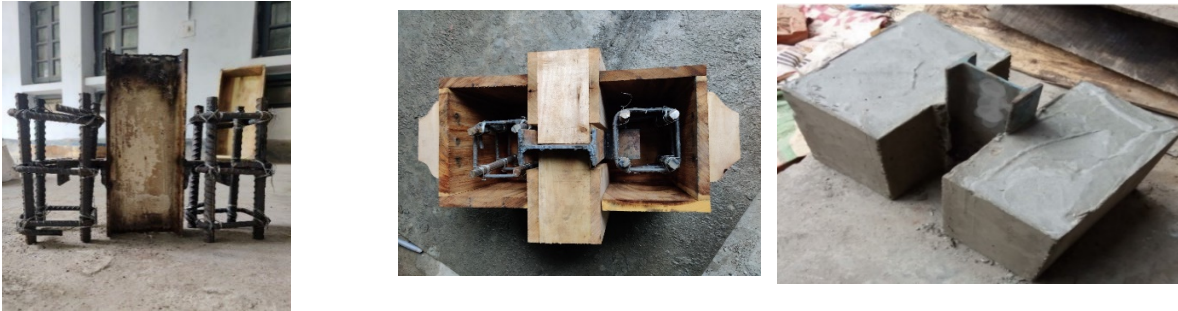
W-shaped girder along with reinforced steel, formwork, and concrete slab specimen
